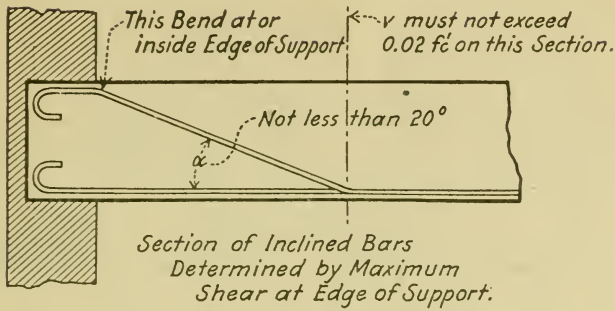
Typical Beam with Web Reinforced by Means of Bars Bent up in Single Plane.
